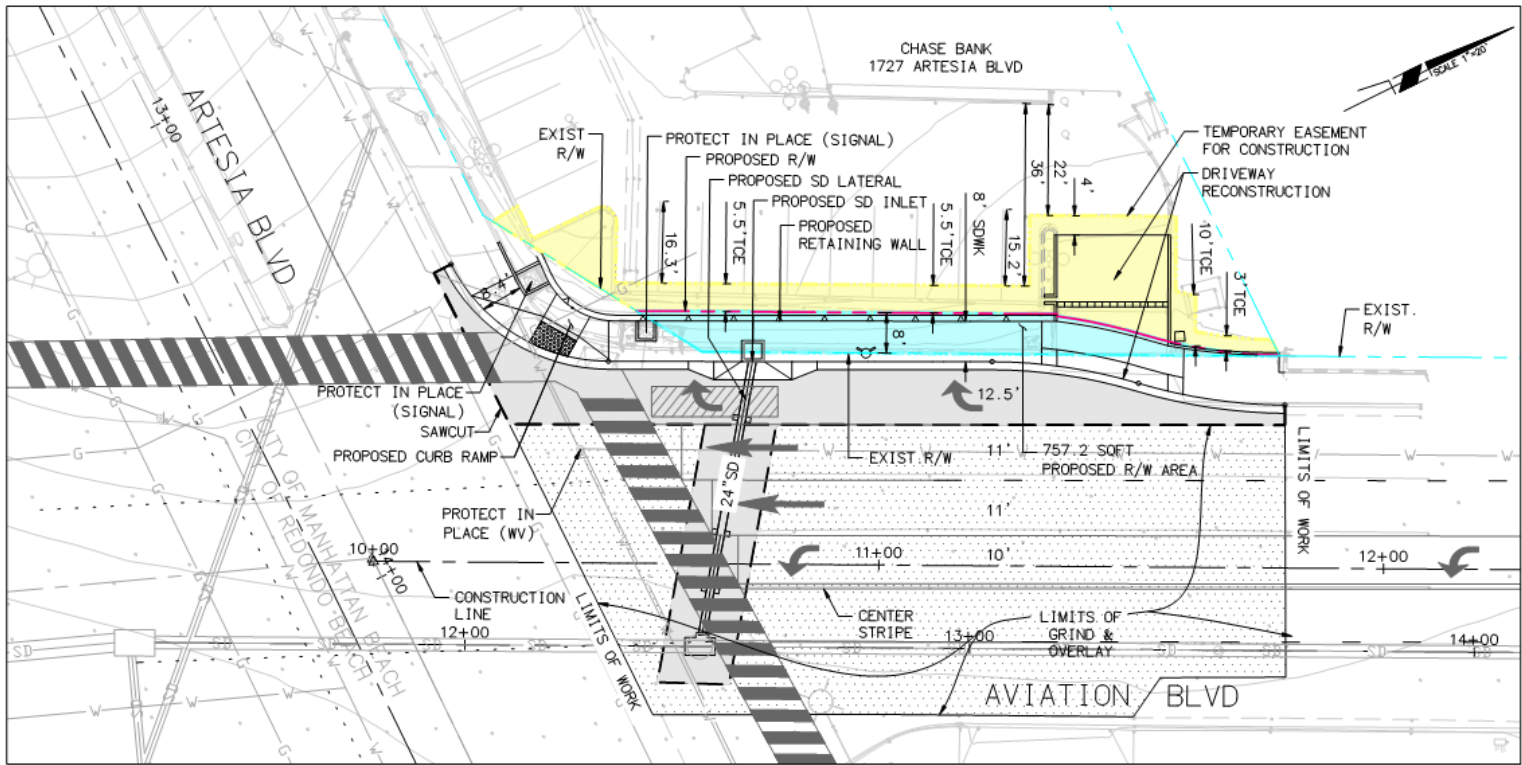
EXHIBIT C - TEMPORARY CONSTRUCTION EASEMENT PLAN
